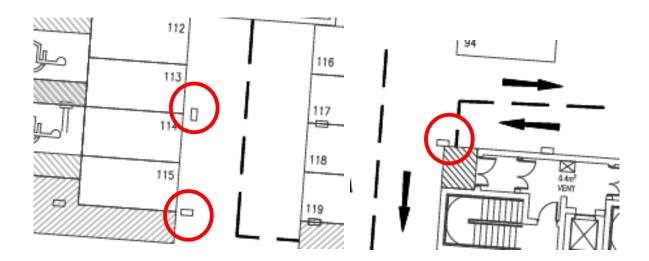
ACM-XX-00-DR-CE-10-001 Rev C.
